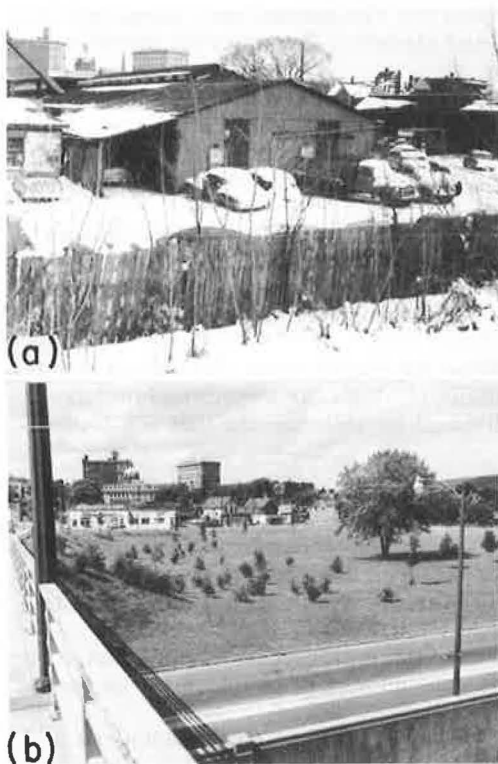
(a) Before: Colliers St. Bridge site looking north towards business district of Binghamton, N.Y. (b) After: same view; note new planting in foreground.
